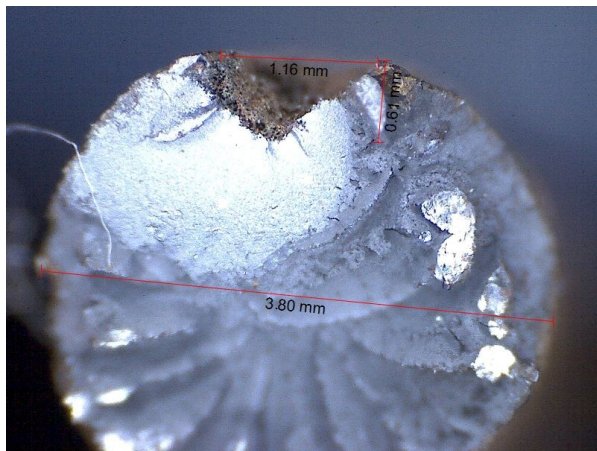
Failure at a corrosion pit location on a strand specimen
